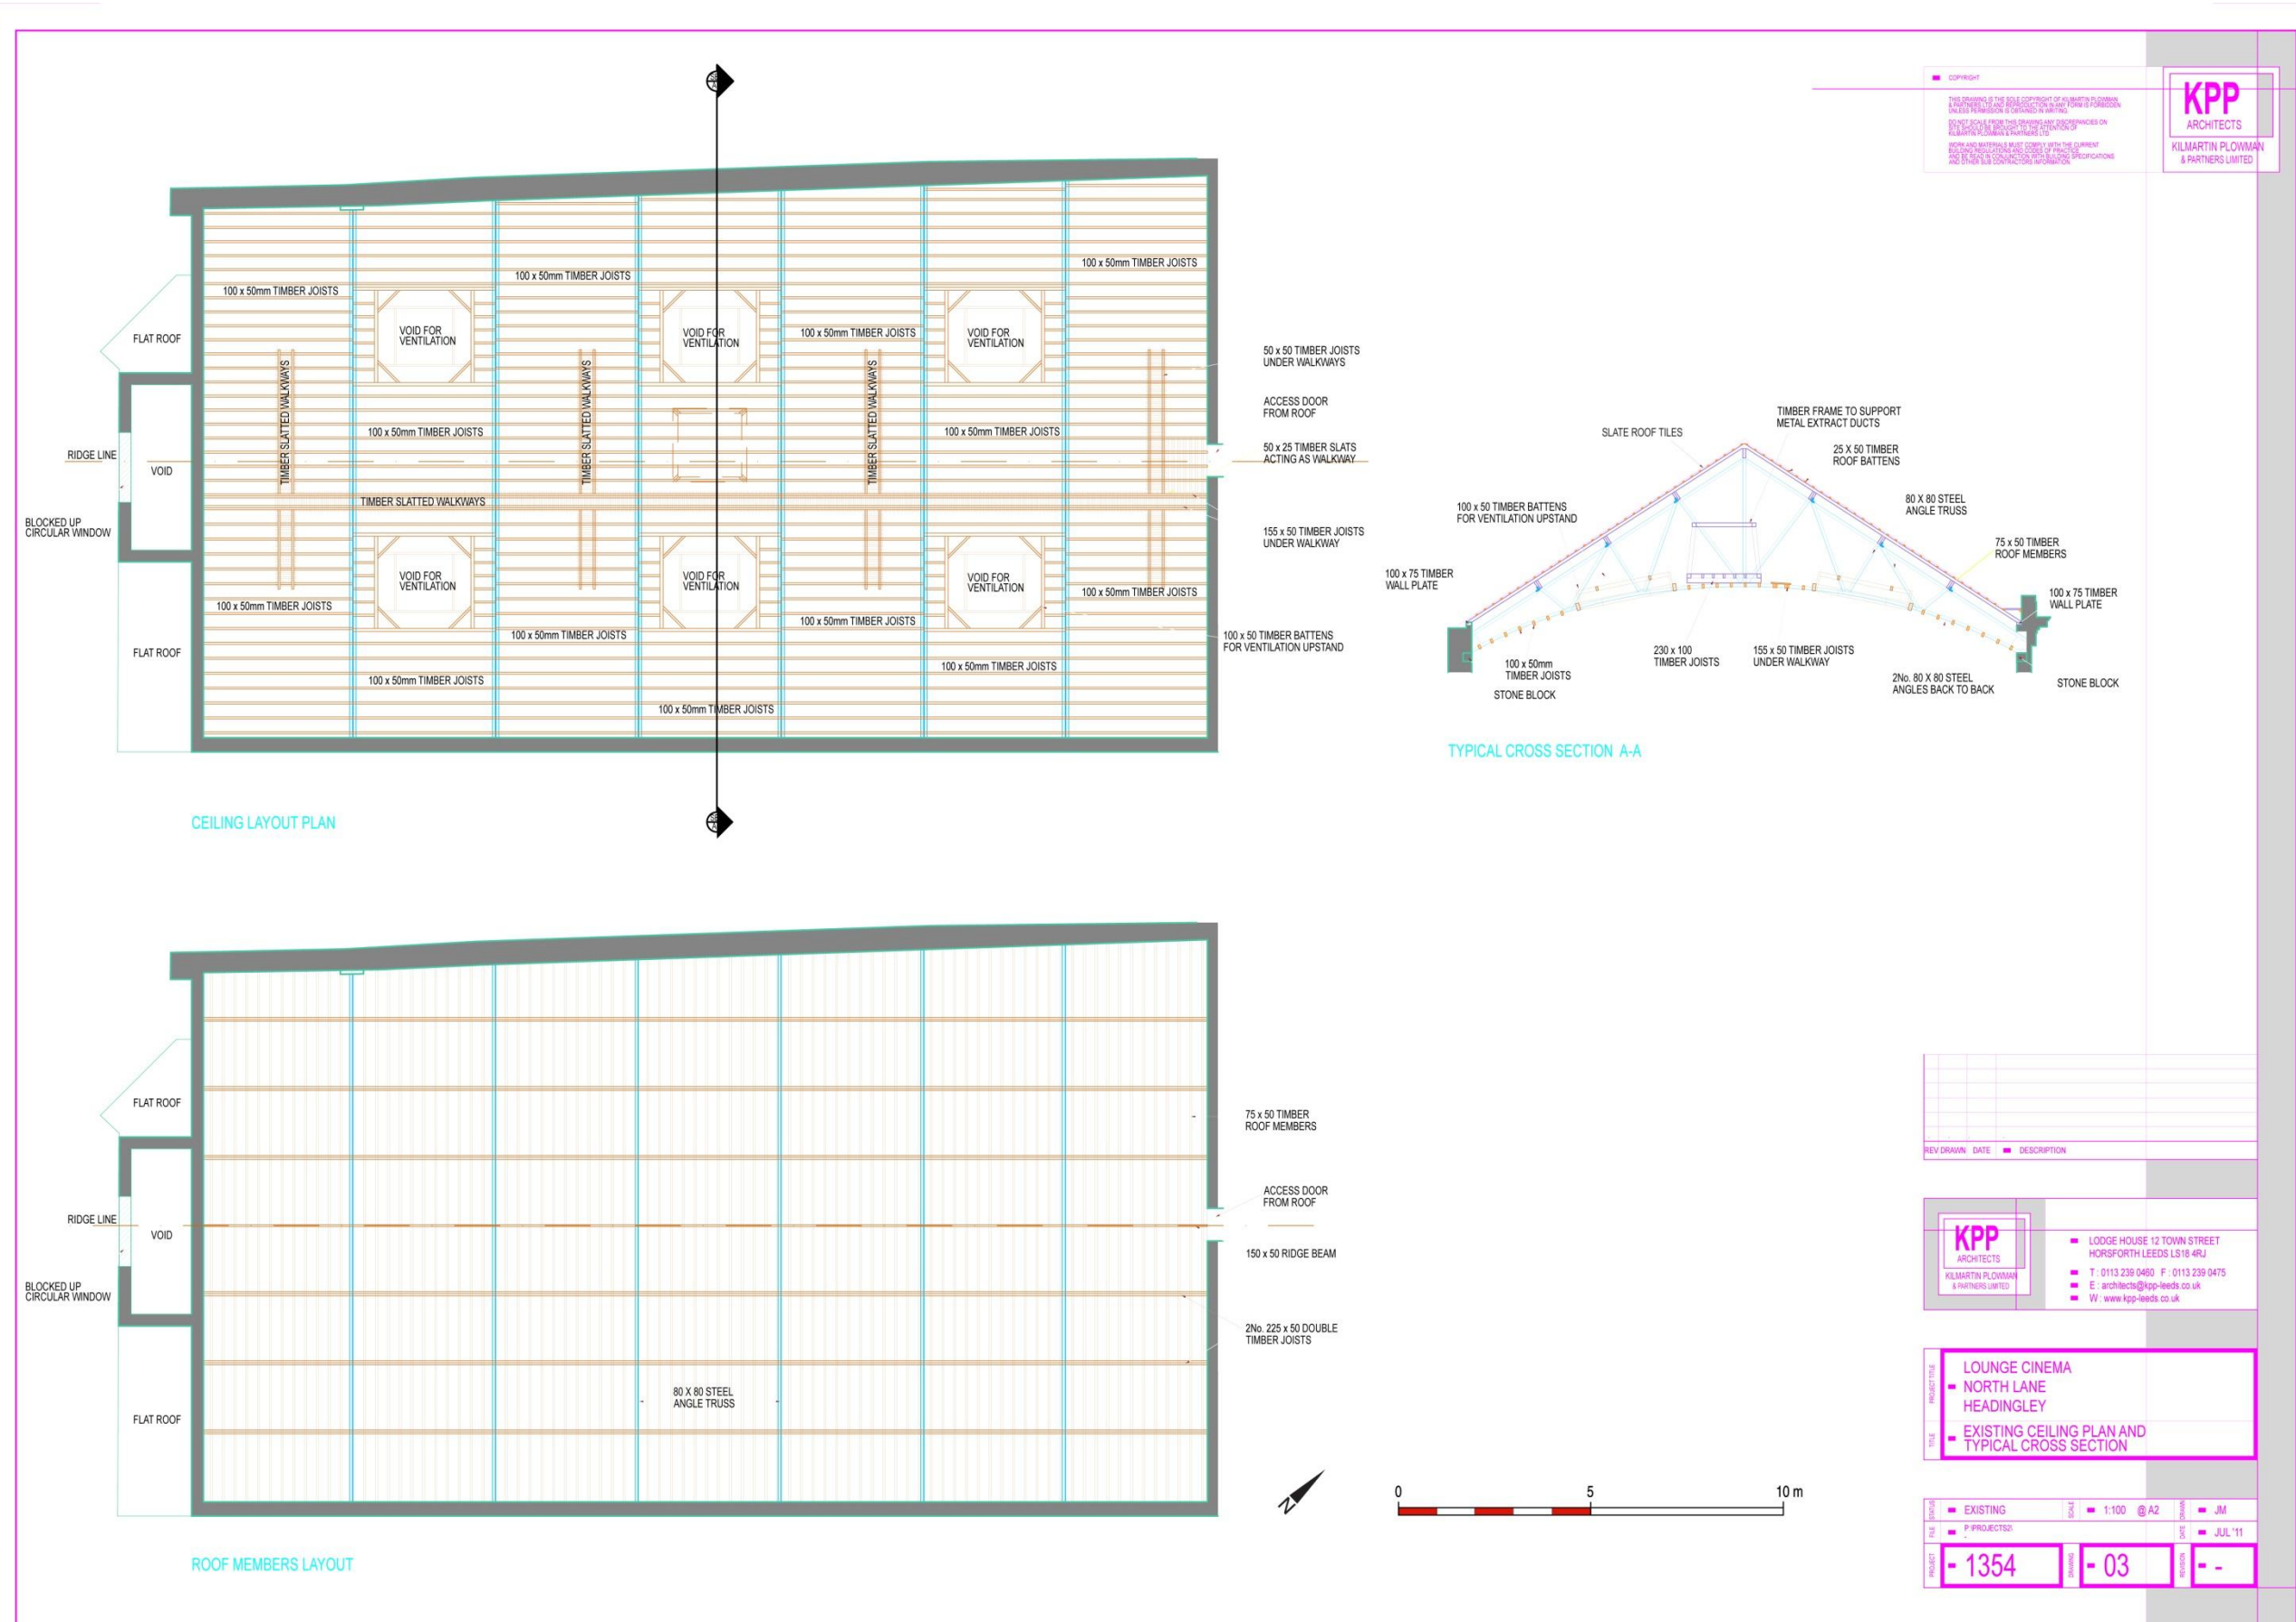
Ceiling plan, roof plan and truss elevation, as of July 2011
